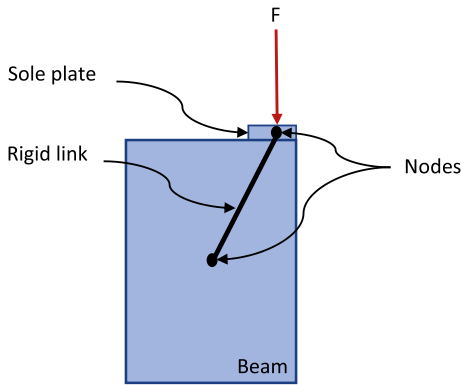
Example of rigid links (beam elements) in a TG FE model
